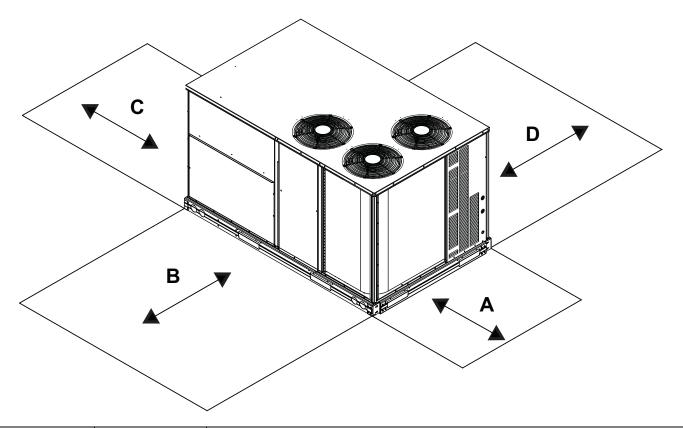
Unit Dimensional Drawing Size 16 (cont)
